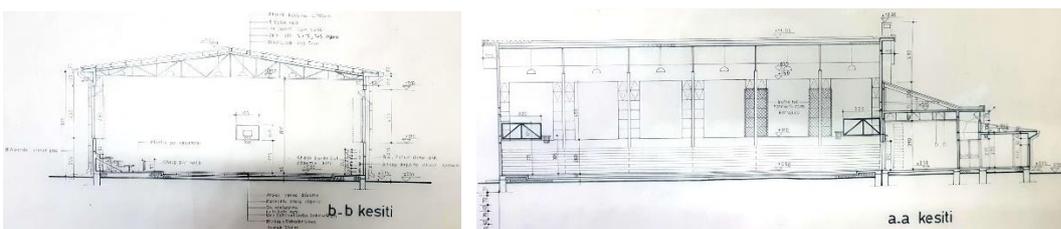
The section drawings of the sports hall (Source: TTK Archive, 2020)
